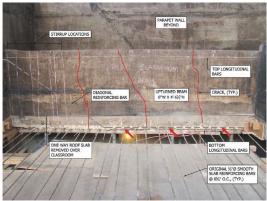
Unity House classroom after roof slab removal (red arrows point to horizontal splitting above longitudinal bars of upturned beam in zone without stirrups)
